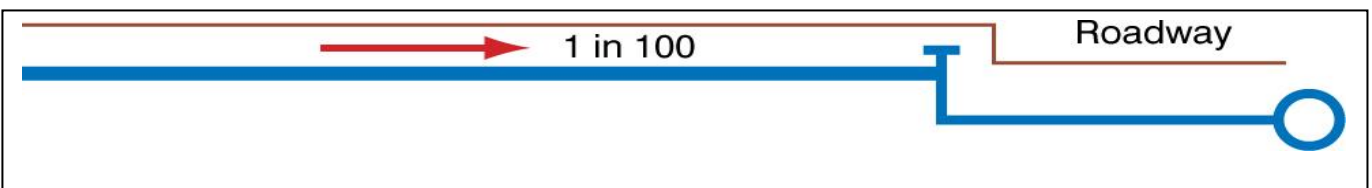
STORMWATER DRAIN LAID WITH BEST POSSIBLE GRADE TO BARREL DRAIN
